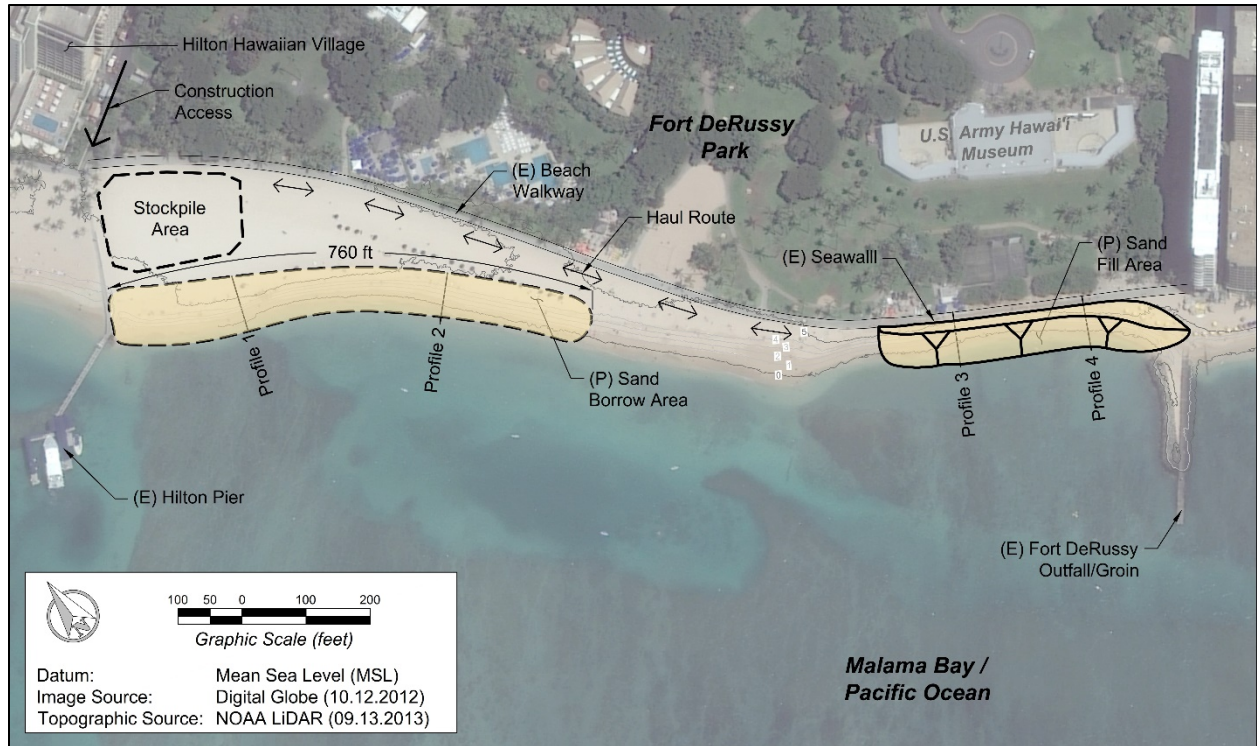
Project layout for proposed action – Fort DeRussy beach sector
